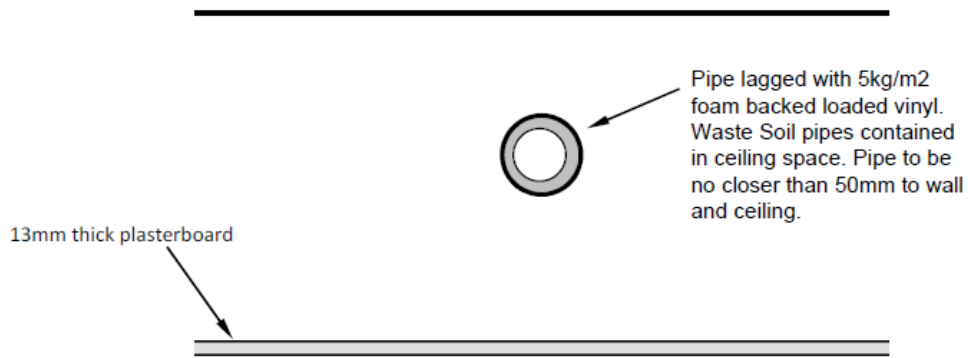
Treatment of Waste and Stormwater pipes over Patient rooms, Offices, Consult/ Exam Rooms, Group rooms, Treatment rooms, Interview rooms and Meeting rooms
